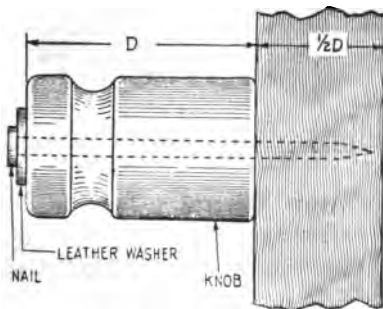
,933.—Correct knob fastening. Unless the member to which knob is fastened be deep enough to permit a nail penetrating to a depth of one half the height of the knob as here shown, use wood screws or nails. On stone or tile walls, special bolts should be used.
